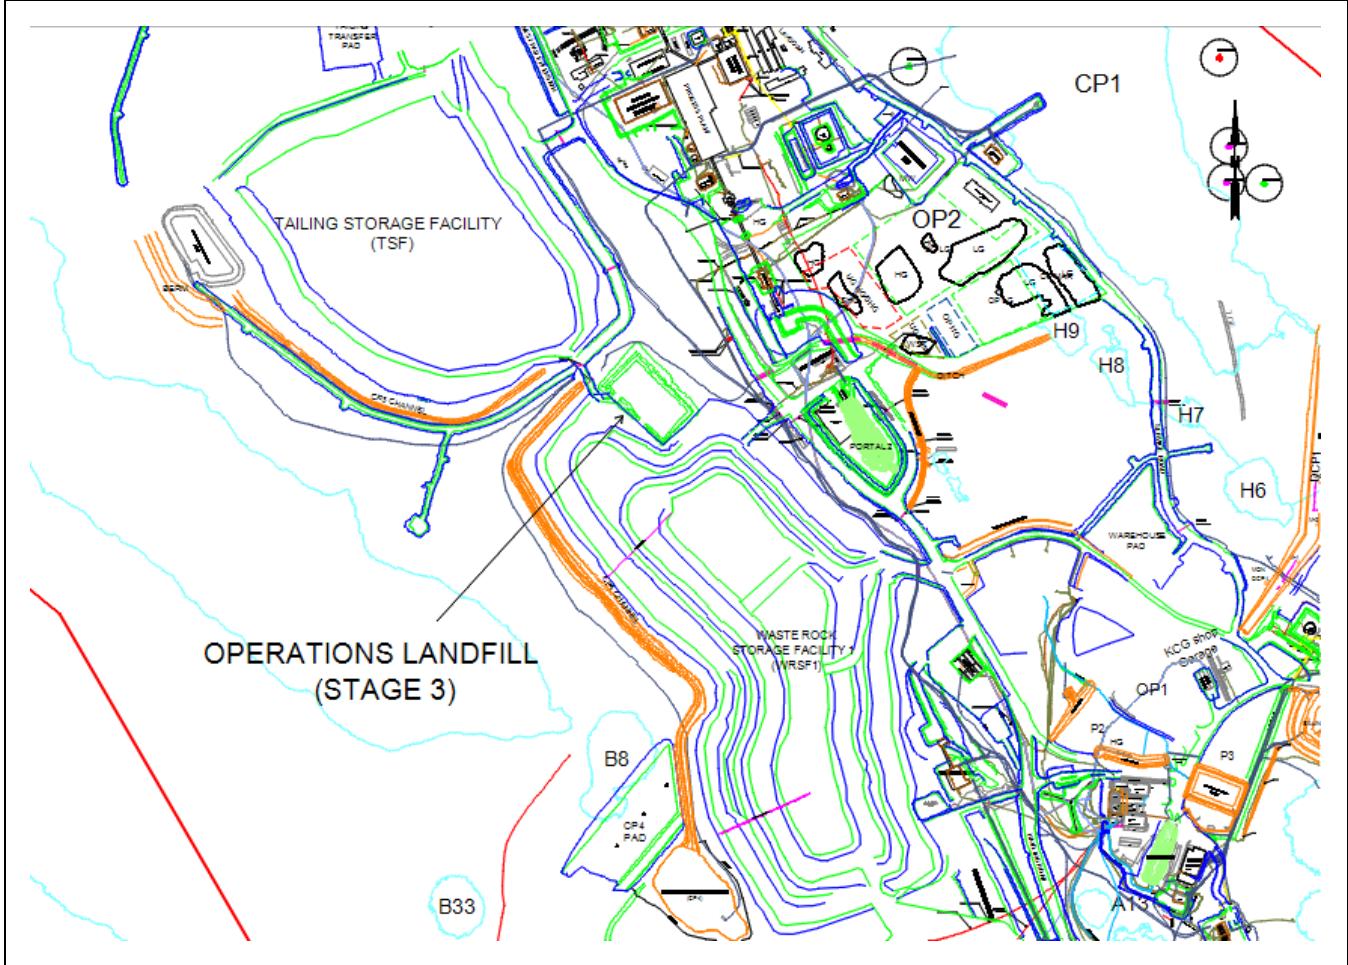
Plan view showing the Operation Landfill (Stage 3)
